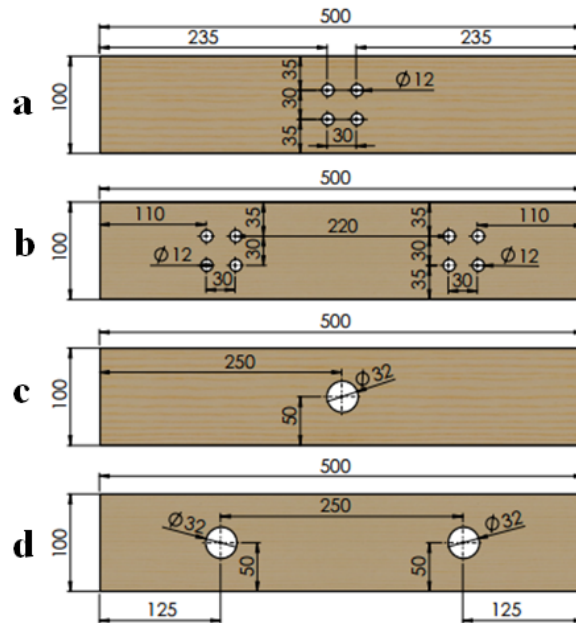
Specimen drilling schemes: specimen group a – II, b – III, c – IV, d – V.
